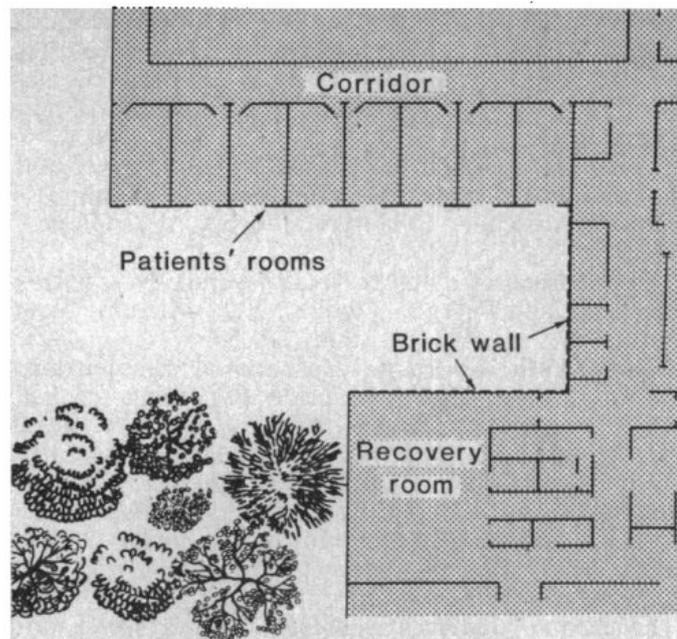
A Plan of the Study Hospital Indicating Different Window Views to the Plants and Brick Wall from Patients' Rooms (Ulrich, 1984).
